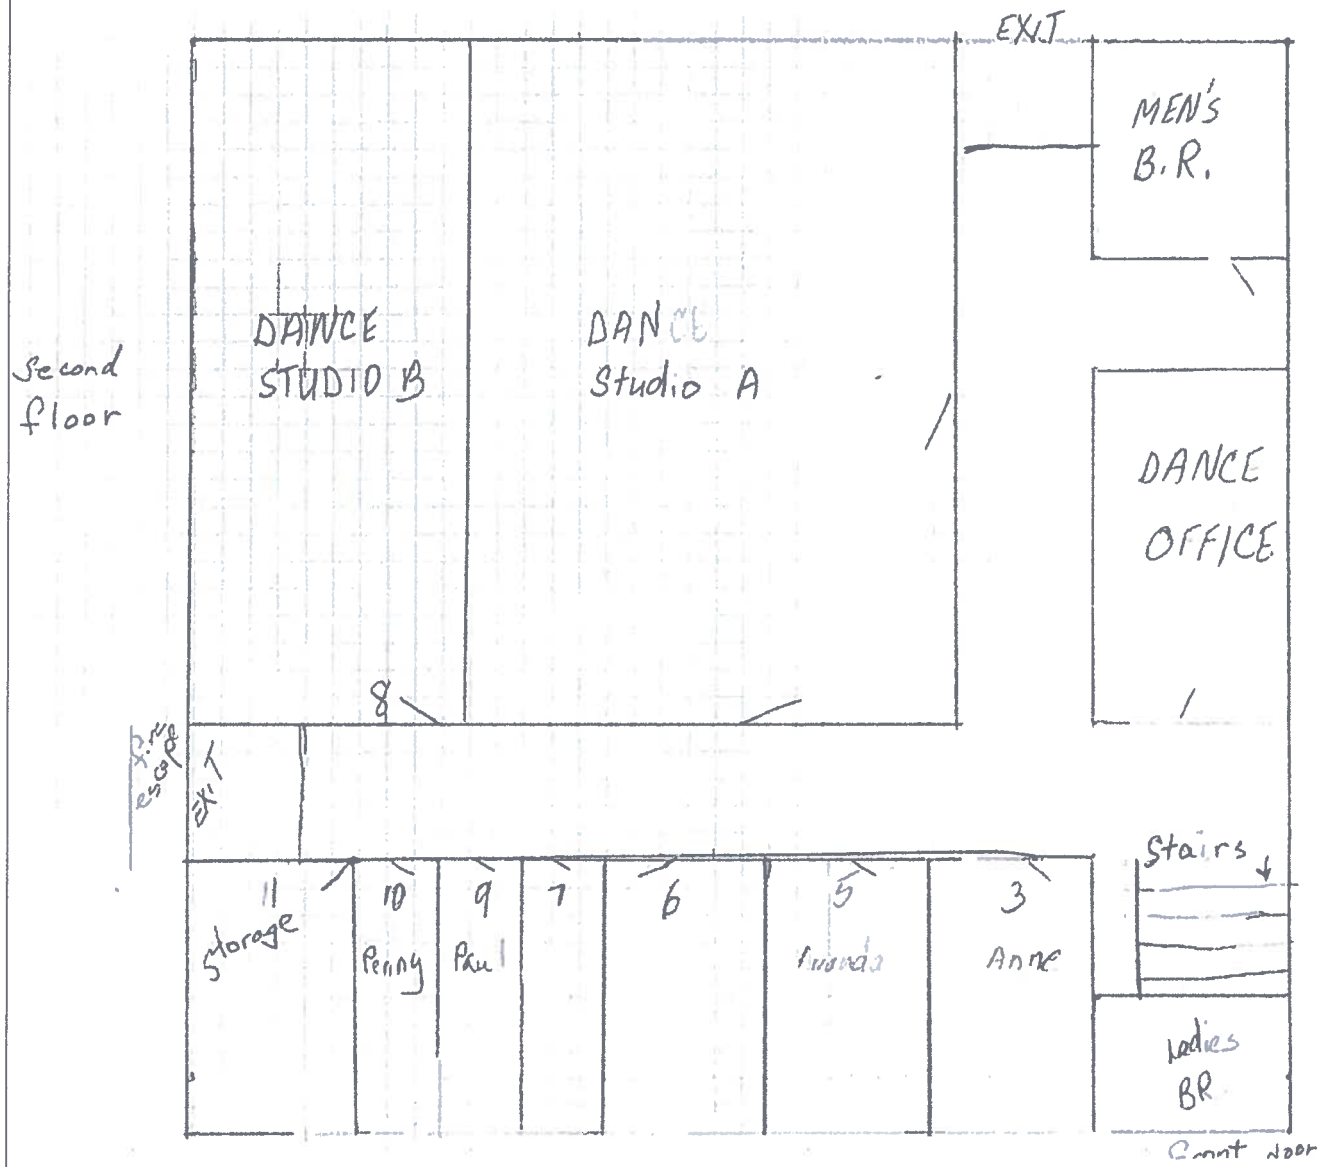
EXHIBIT C: CONCEPT FLOOR PLAN OF SUITES 6 AND 7
